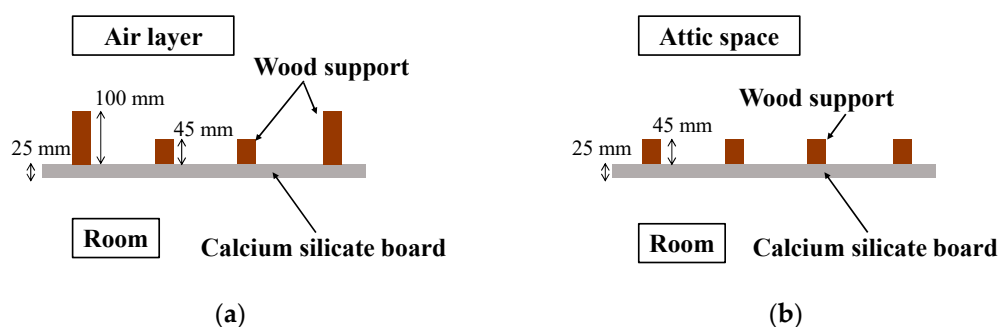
Structure of the inner wall and ceiling: (a) schematic horizontal section of the inner wall; (b) schematic vertical section of the ceiling.
